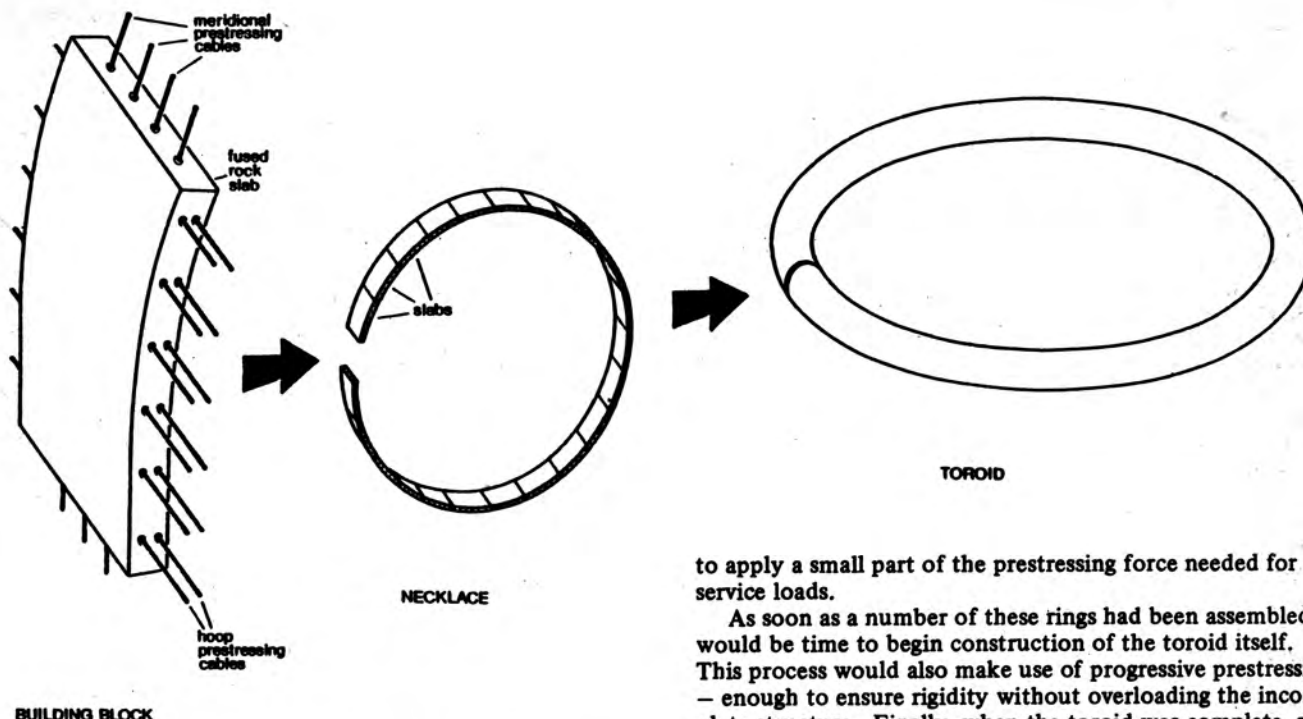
Structural detail of a prestressed concrete Space Colony. Basic construction unit is a rectangular slab of fused rock 1.6 metres thick.
